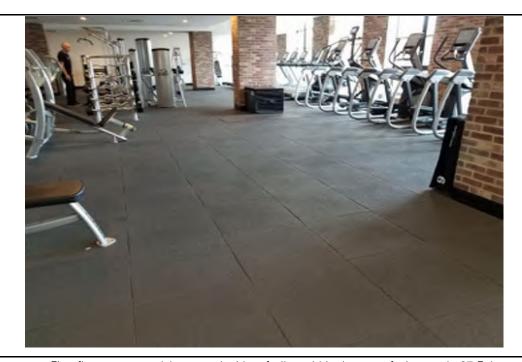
First floor concrete slab covered with soft tiles within the gym, facing north. 27 February 2019.
